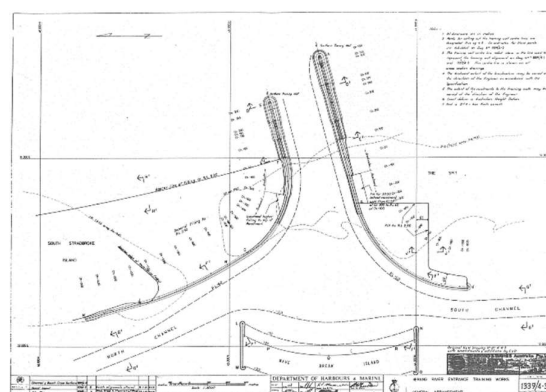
Seaway construction plan (Department Harbours and Marine, 1980).
